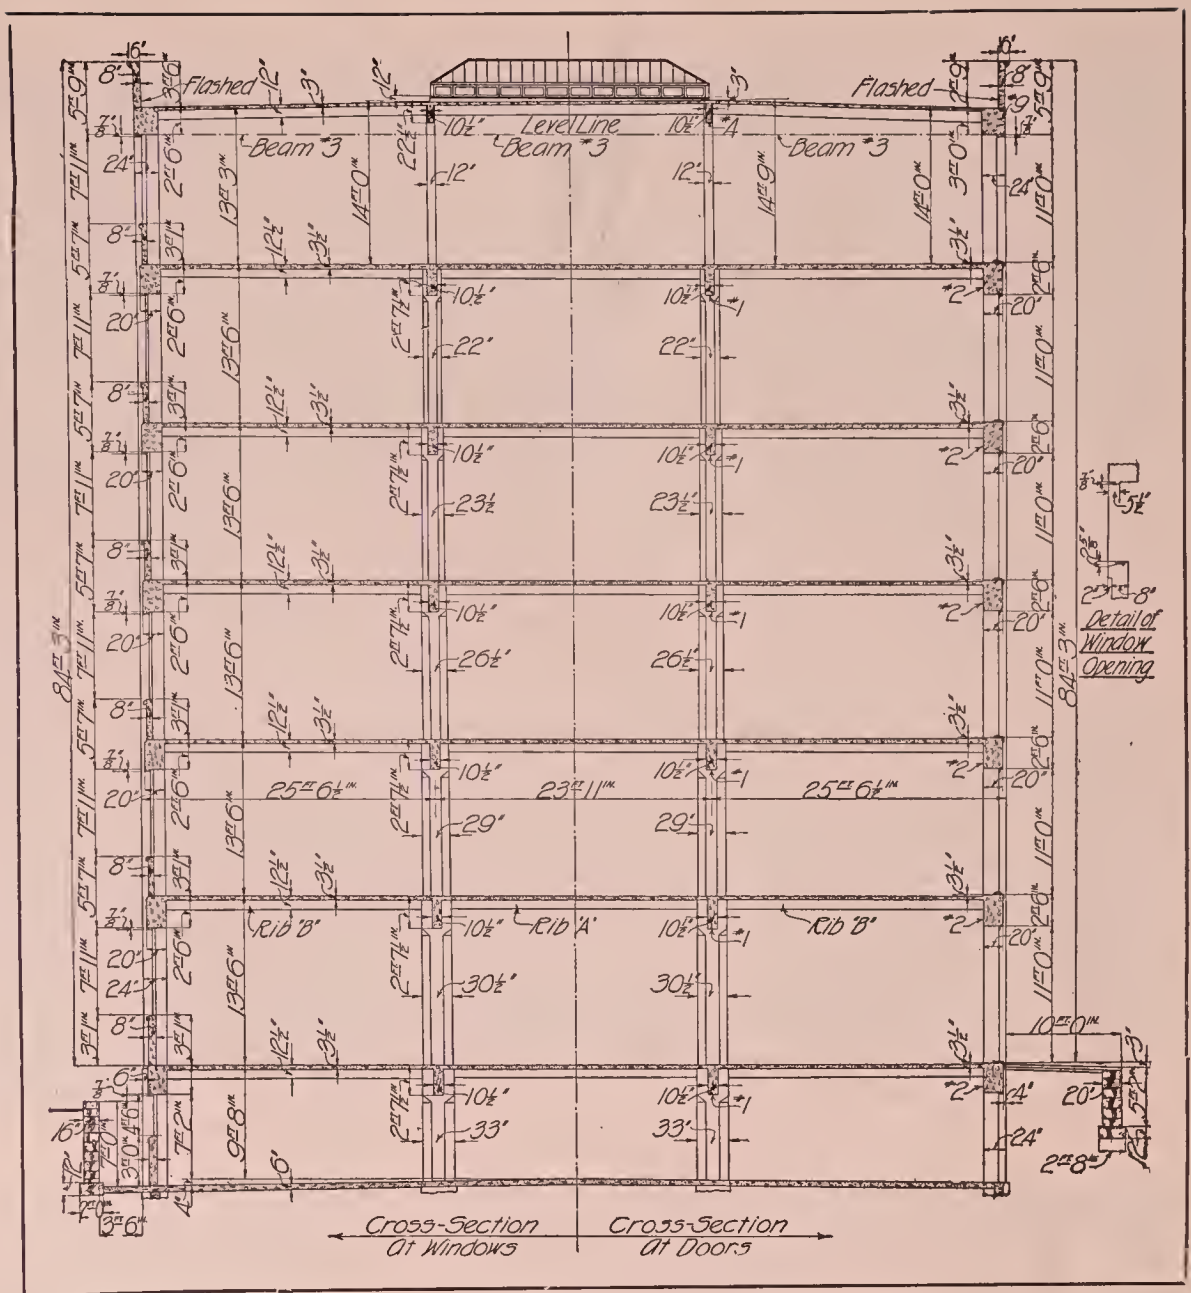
Sectional Elevation of Bush Factory No. 2.
